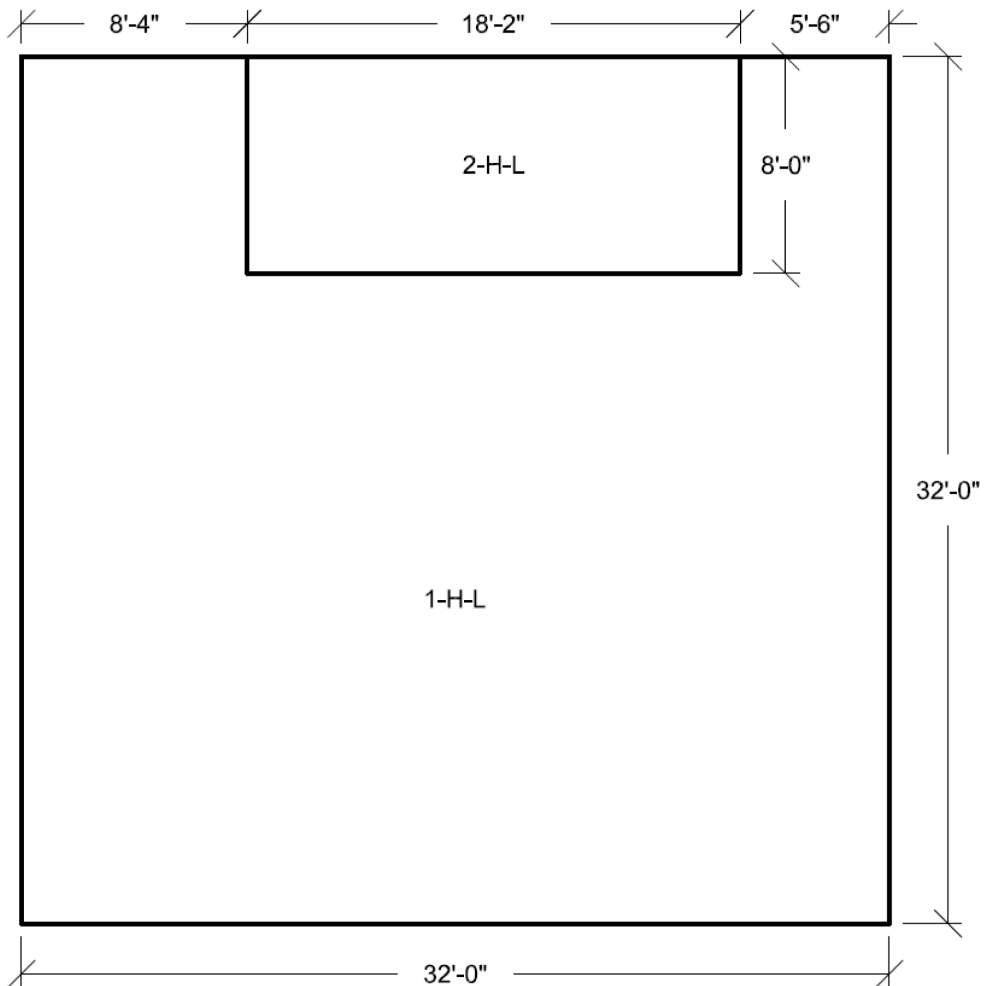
H.6-192 DGFOV Wall 13 Looking From Outside
